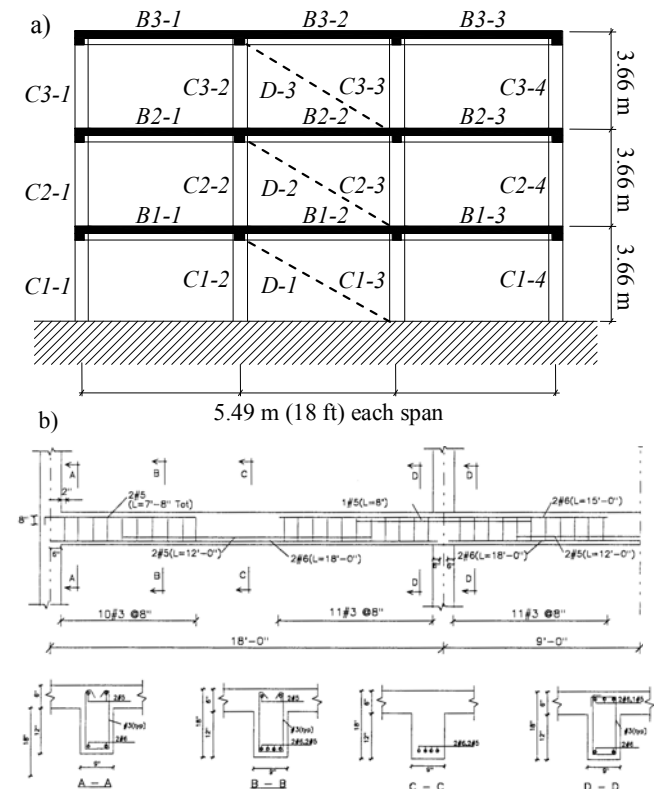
a) General layout of the structure and braces arrangement, b) beam reinforcement detailing.
